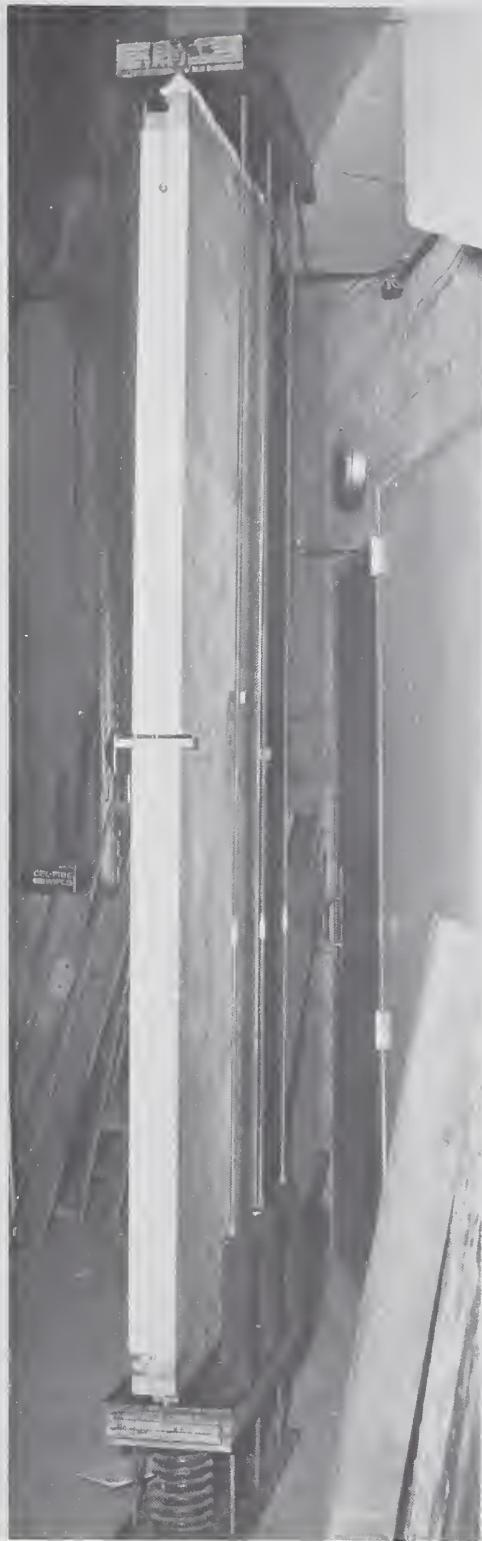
Long-term compressive load test with eccentric-bottom support.
